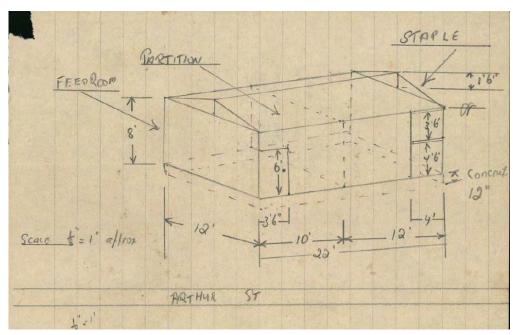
Plan of proposed stable and feed shed, 1971. (Source: City of Grafton, BA71/85)
